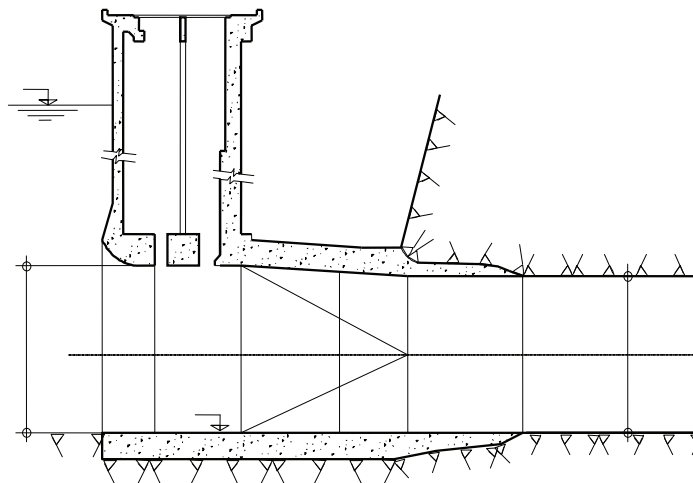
Typical longitudinal section of a diversion channel.
